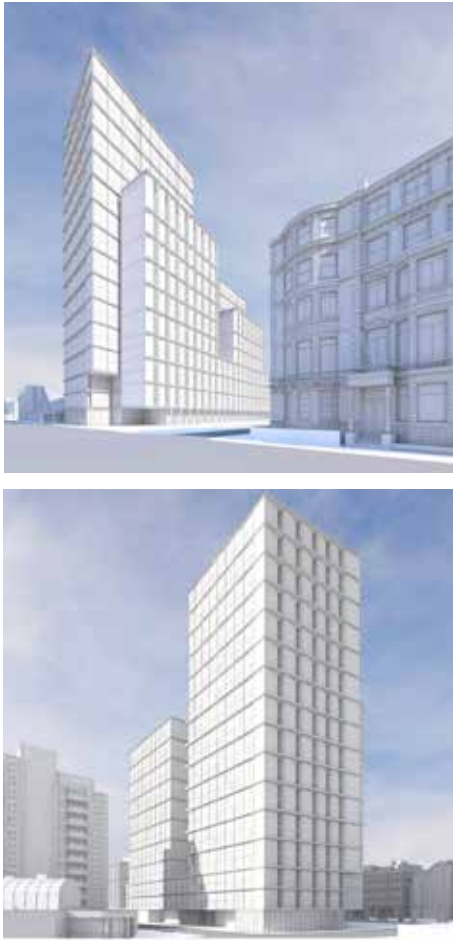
Massing views of the proposal looking east and west along Cromwell Road
